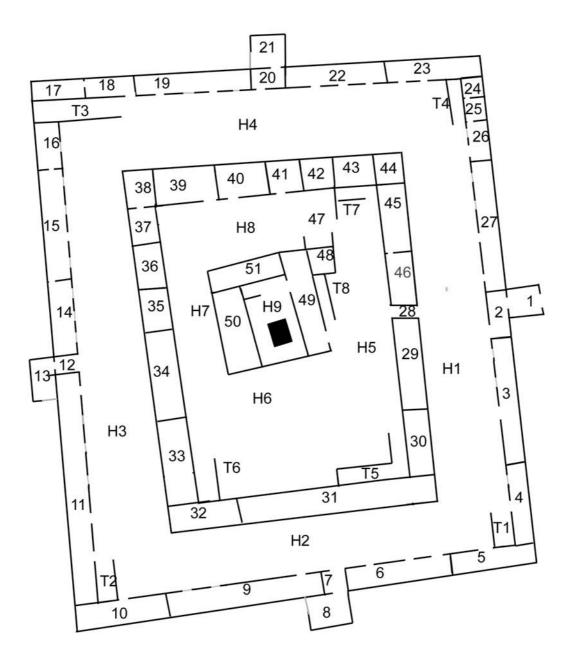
Sketch plan with labeling of rooms. Light gray sections are doors which were blocked.
